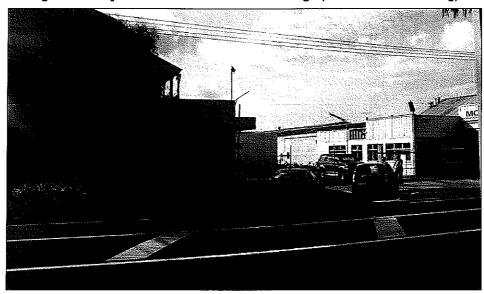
Subject Site's Princes Drive Frontage (Commercial Building/ Adjoining Machinery Yard)
